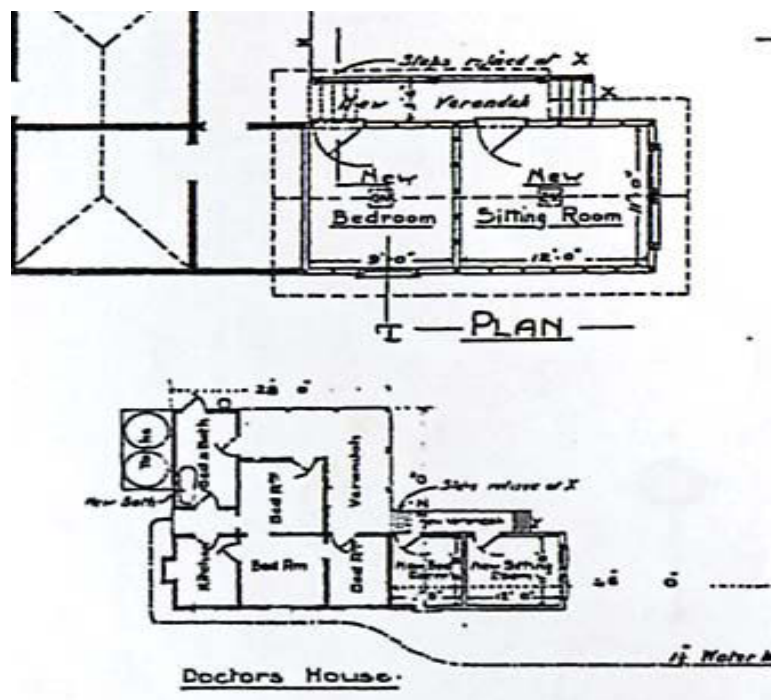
Later plan of the original doctor's house constructed on Dorre Island with extension (bottom) and structure (above) that did not appear on the early plan (States Record Office, Cons 1647 P.W.D WA15024).
